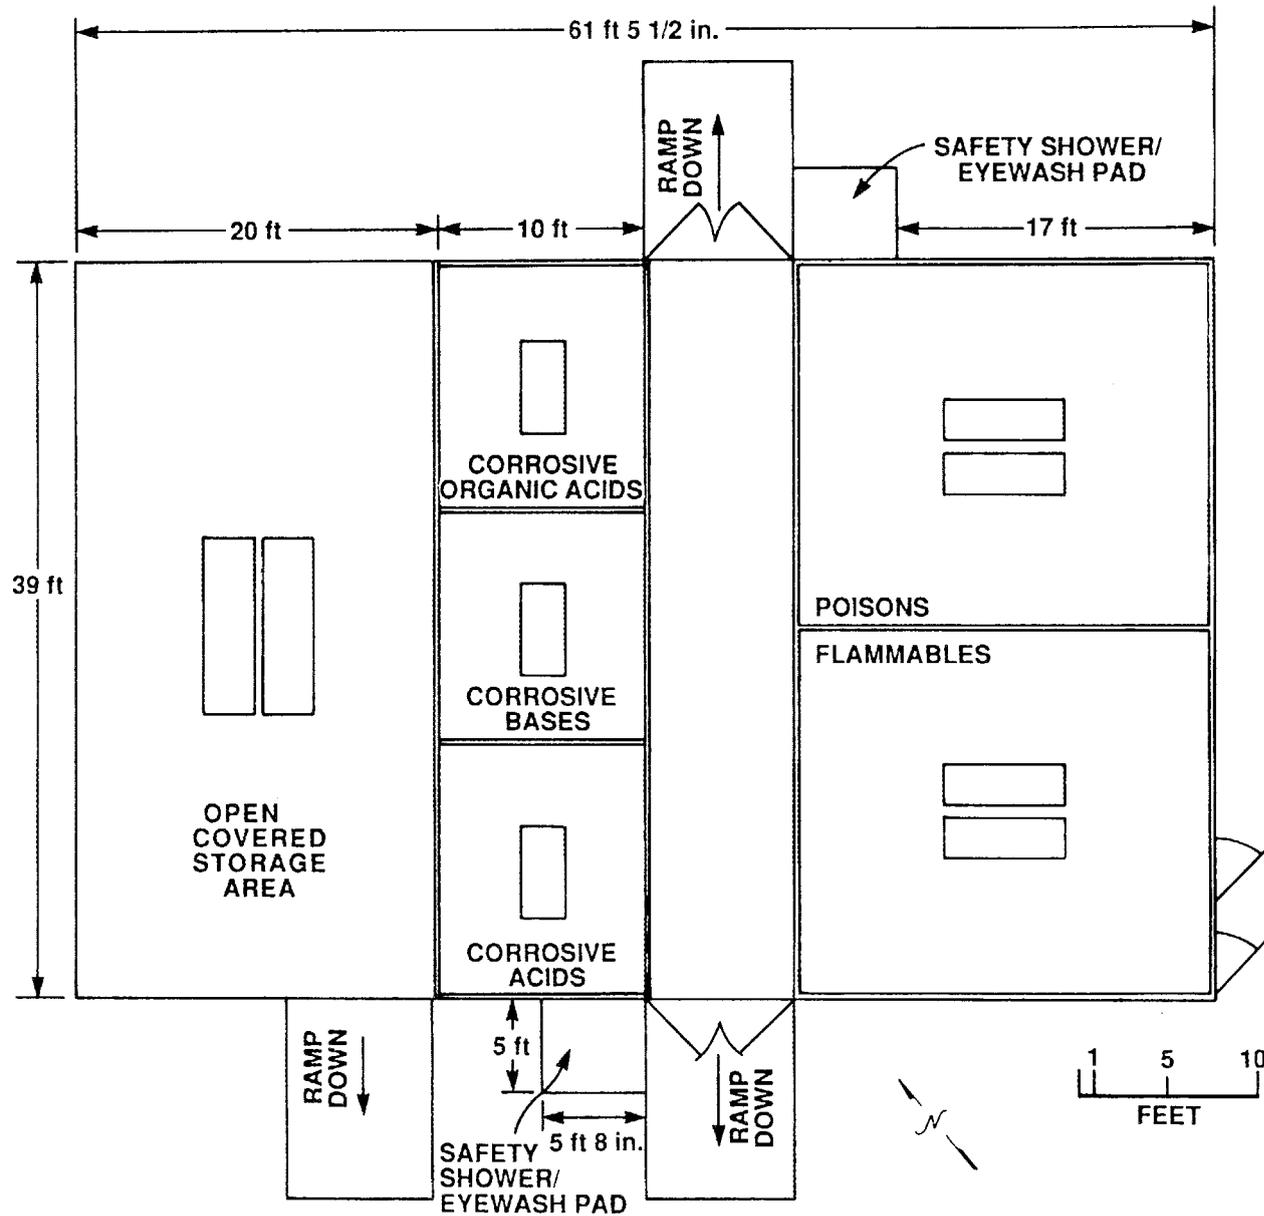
Layout of Building 70 Hazardous Waste Storage Facility.
